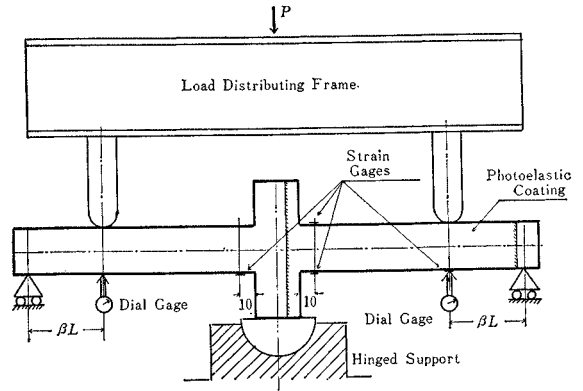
(b) Test Setup of One End Clamped and the Other End Simply Supported Beam
